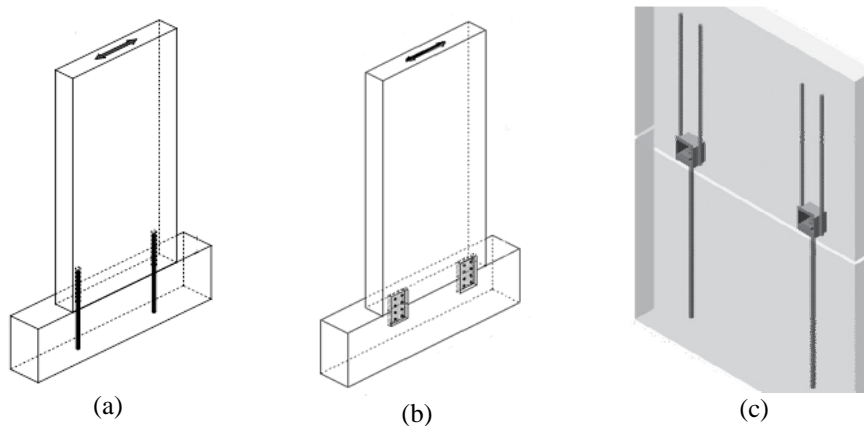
Connection types considered in the experiments: (a) ‘rebar’ connections; (b) ‘steel plate’ connections; (c) industrial wall shoes.
